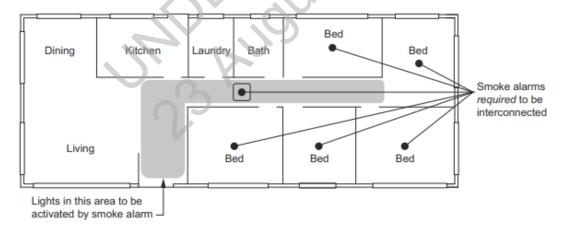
Class 1b building, location of smoke alarms where multiple bedrooms are served by a hallway is illustrated by the black dots.
